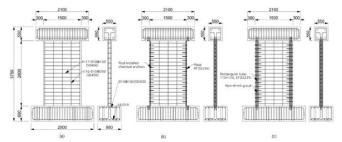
Elevations of The Specimen. (Kim et al., 2021)
